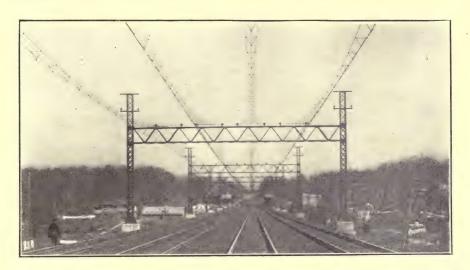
New York, New Haven and Hartford Railroad. Overhead Construction.
